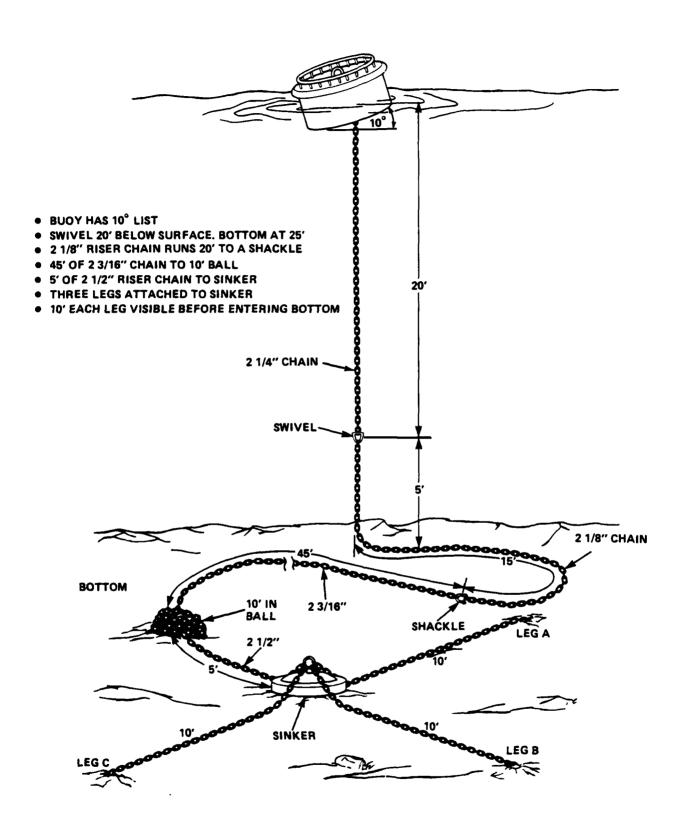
SCHEMATIC DRAWING OF MOORING B-6
